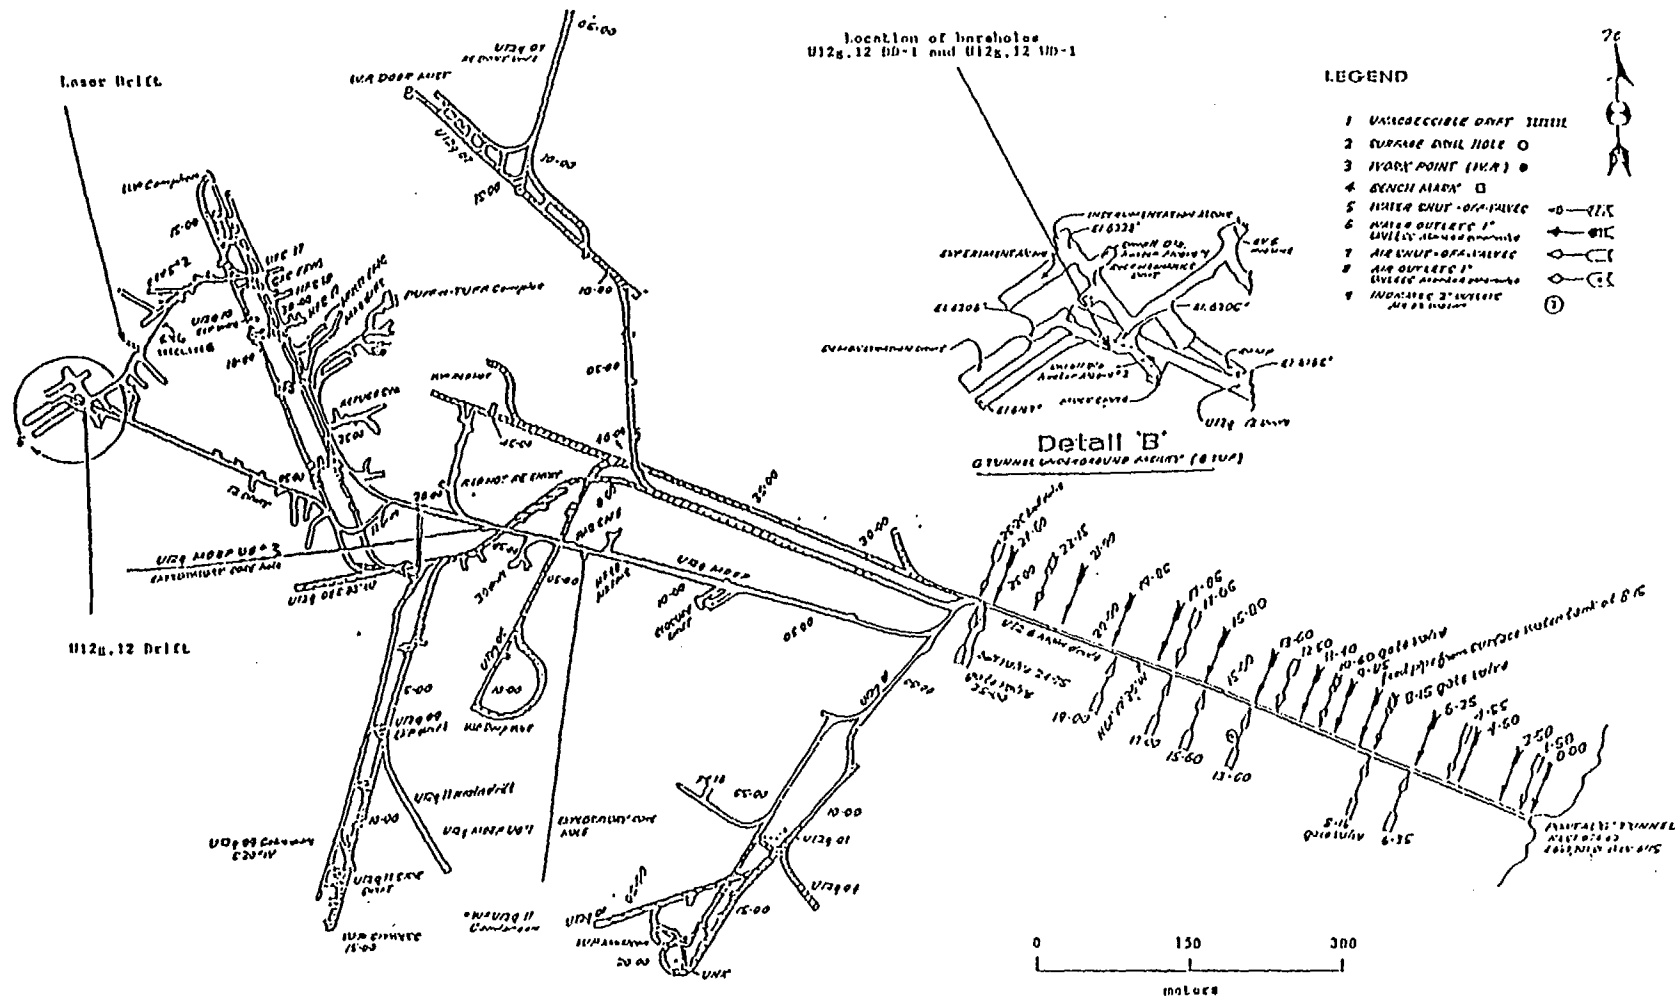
Map of G-Tunnel with a detailed enlargement of the G-Tunnel Underground Facility.
